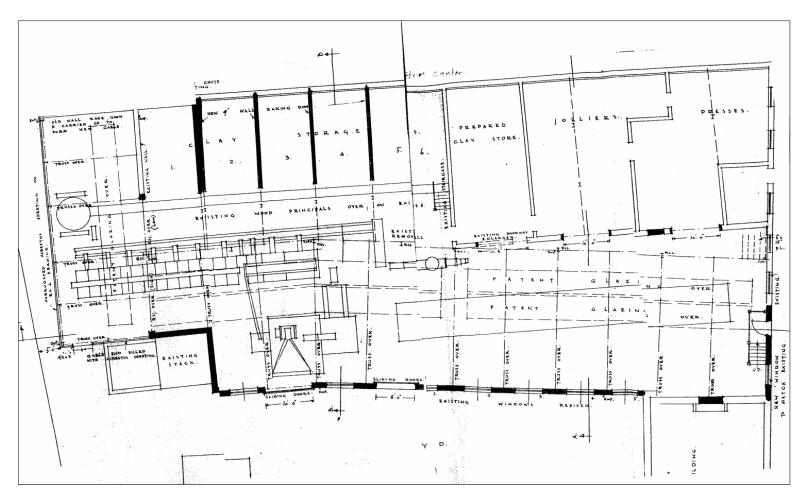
Plan of Buildings Y and Z showing reorganisation of the 1929 build (right) with where the Bone House had lain (left)³⁴
